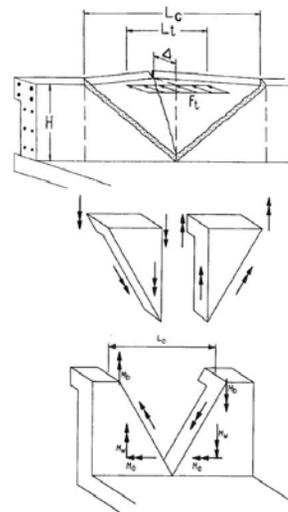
Yield Line Analysis of Concrete Parapet Walls for Impact within Wall Segment
